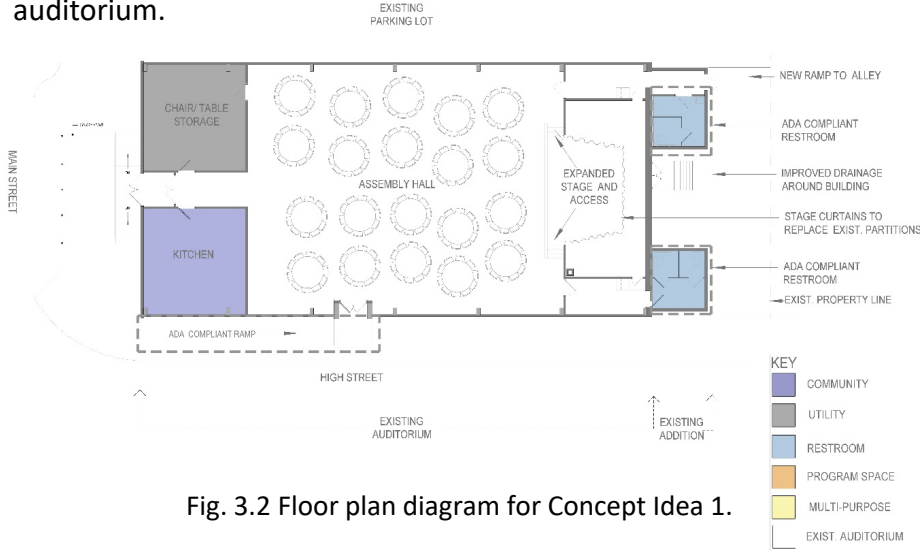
Floor plan diagram for Concept Idea 1.
